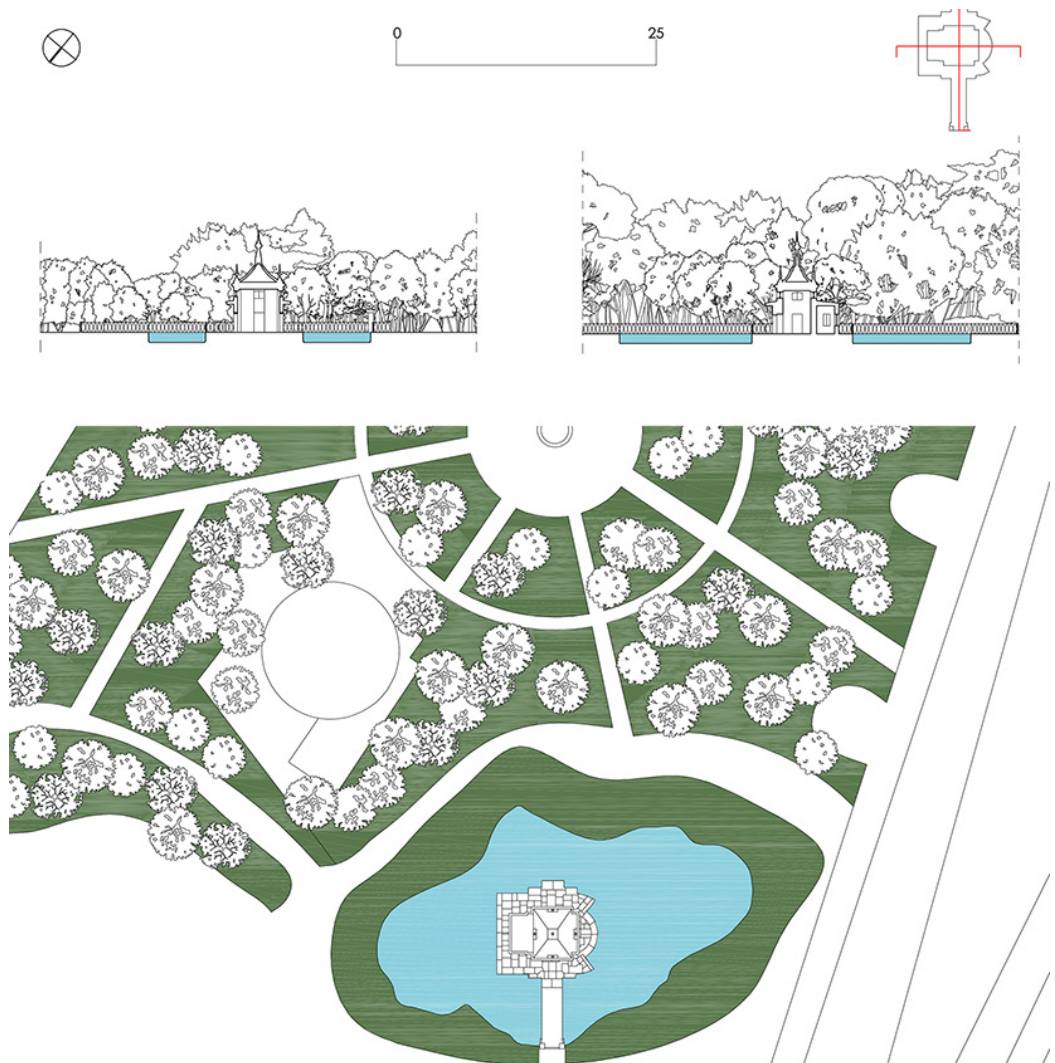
The Retiro Park in Madrid, the *Casita del Pescador*, roofs plan, section A-A' (left), section B-B' (right).
